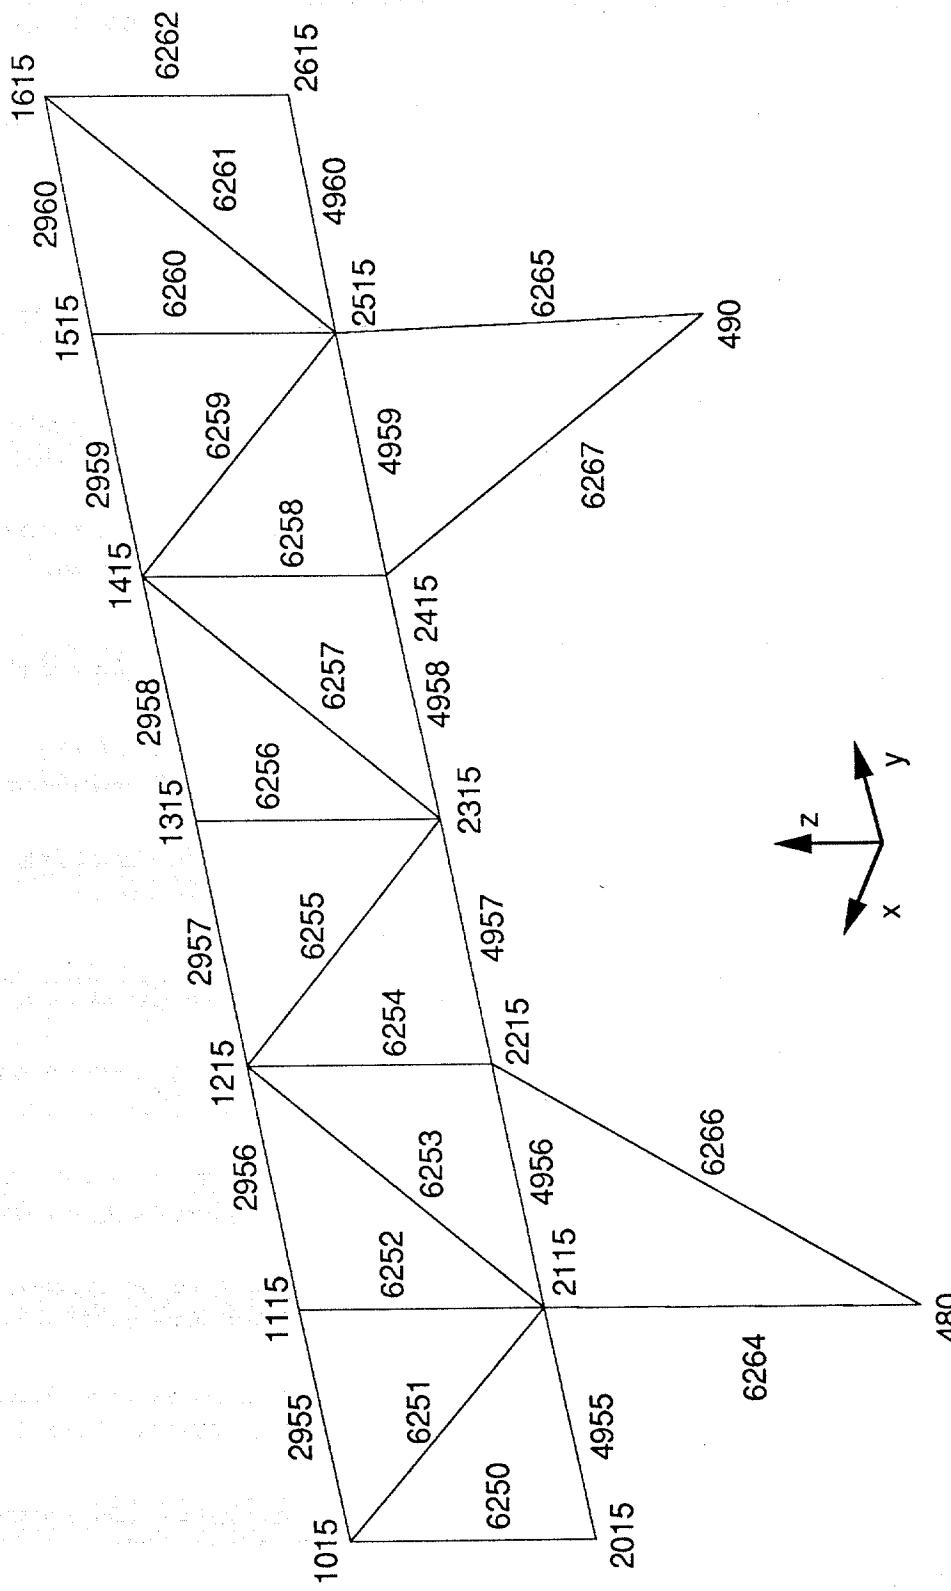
Row 4 Elevation Element and Grid Point Numbers
